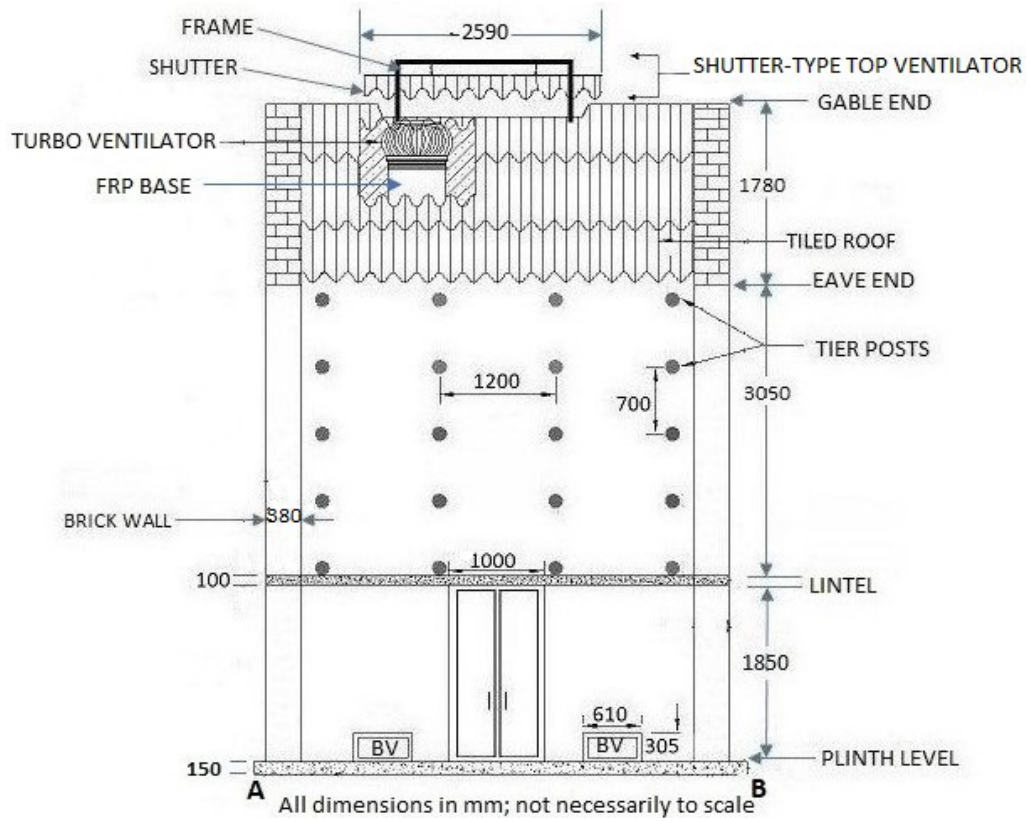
FRONT ELEVATION SIDE AB — BARN TYPE A
